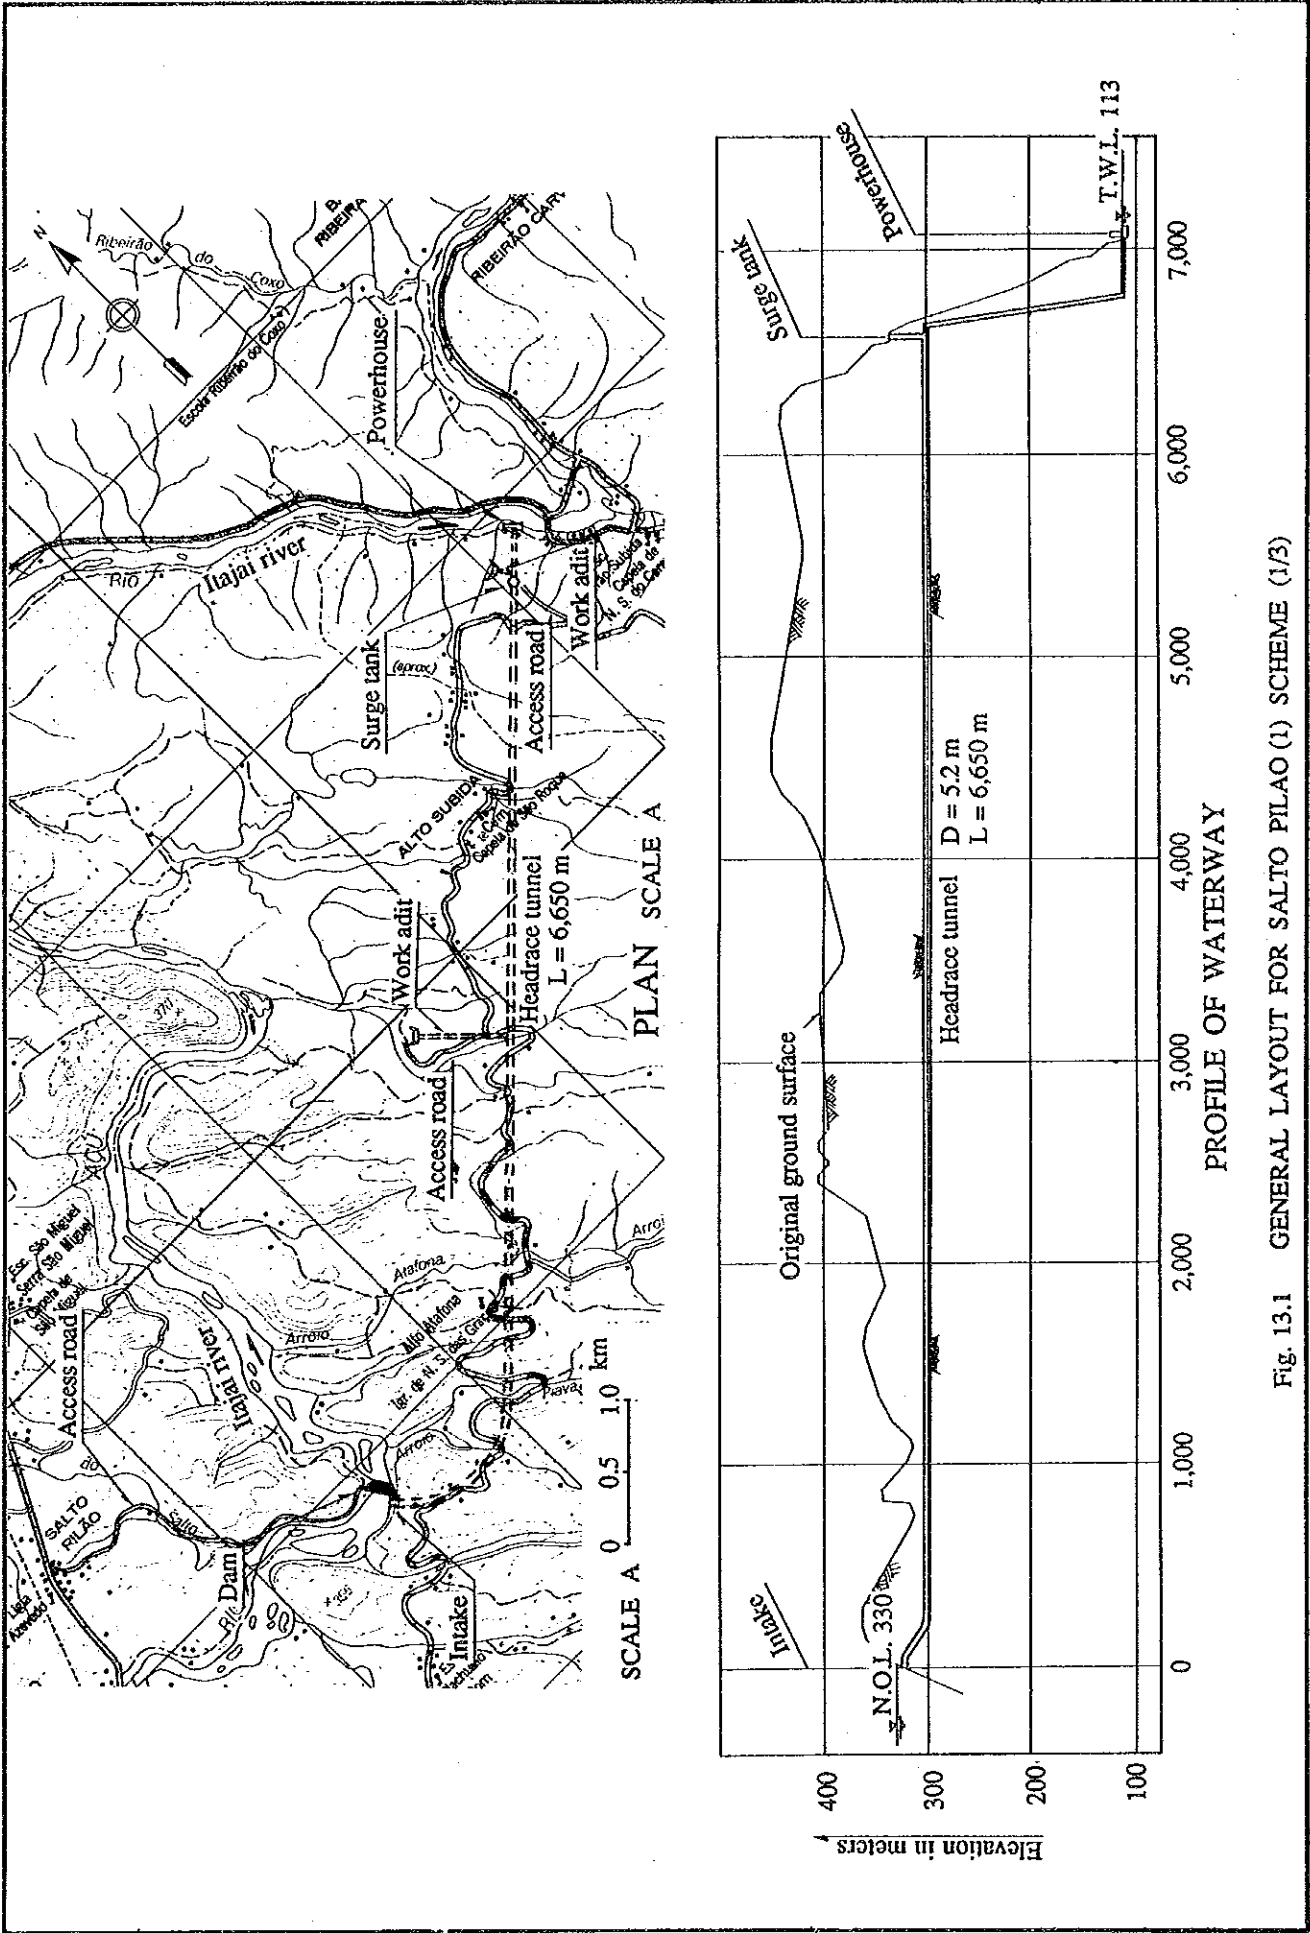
GENERAL LAYOUT FOR SALTO PILAO (1) SCHEME (1/3)
